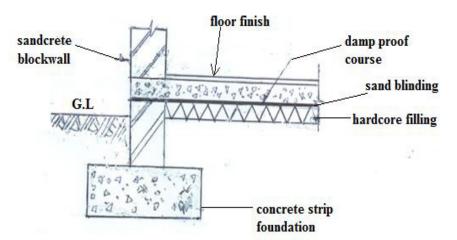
Cross section of the Substructure of a solid wall building.
